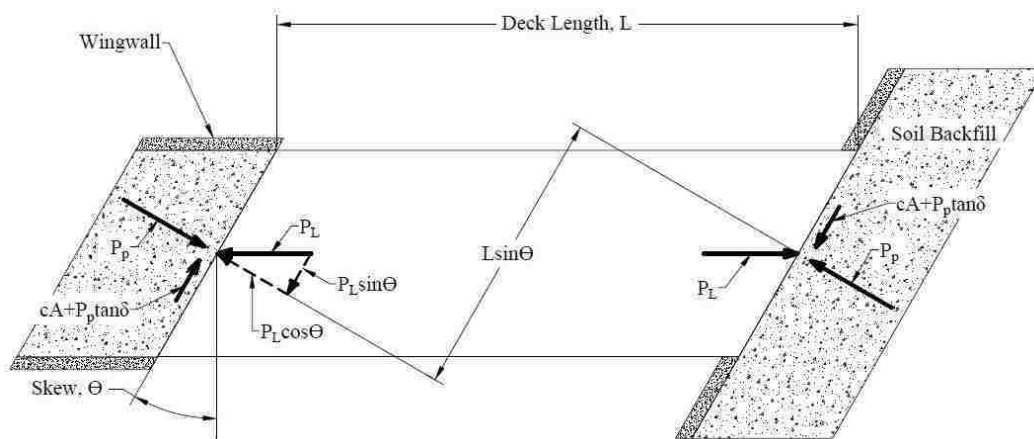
Typical forces on skewed bridge from lateral loading, adapted from Burke Jr. (1994).
